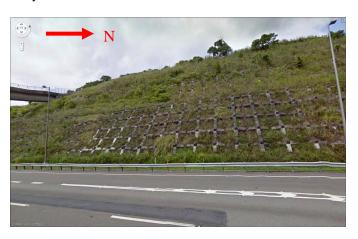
Photos of original ground anchor slope on Formosa Freeway before failure
